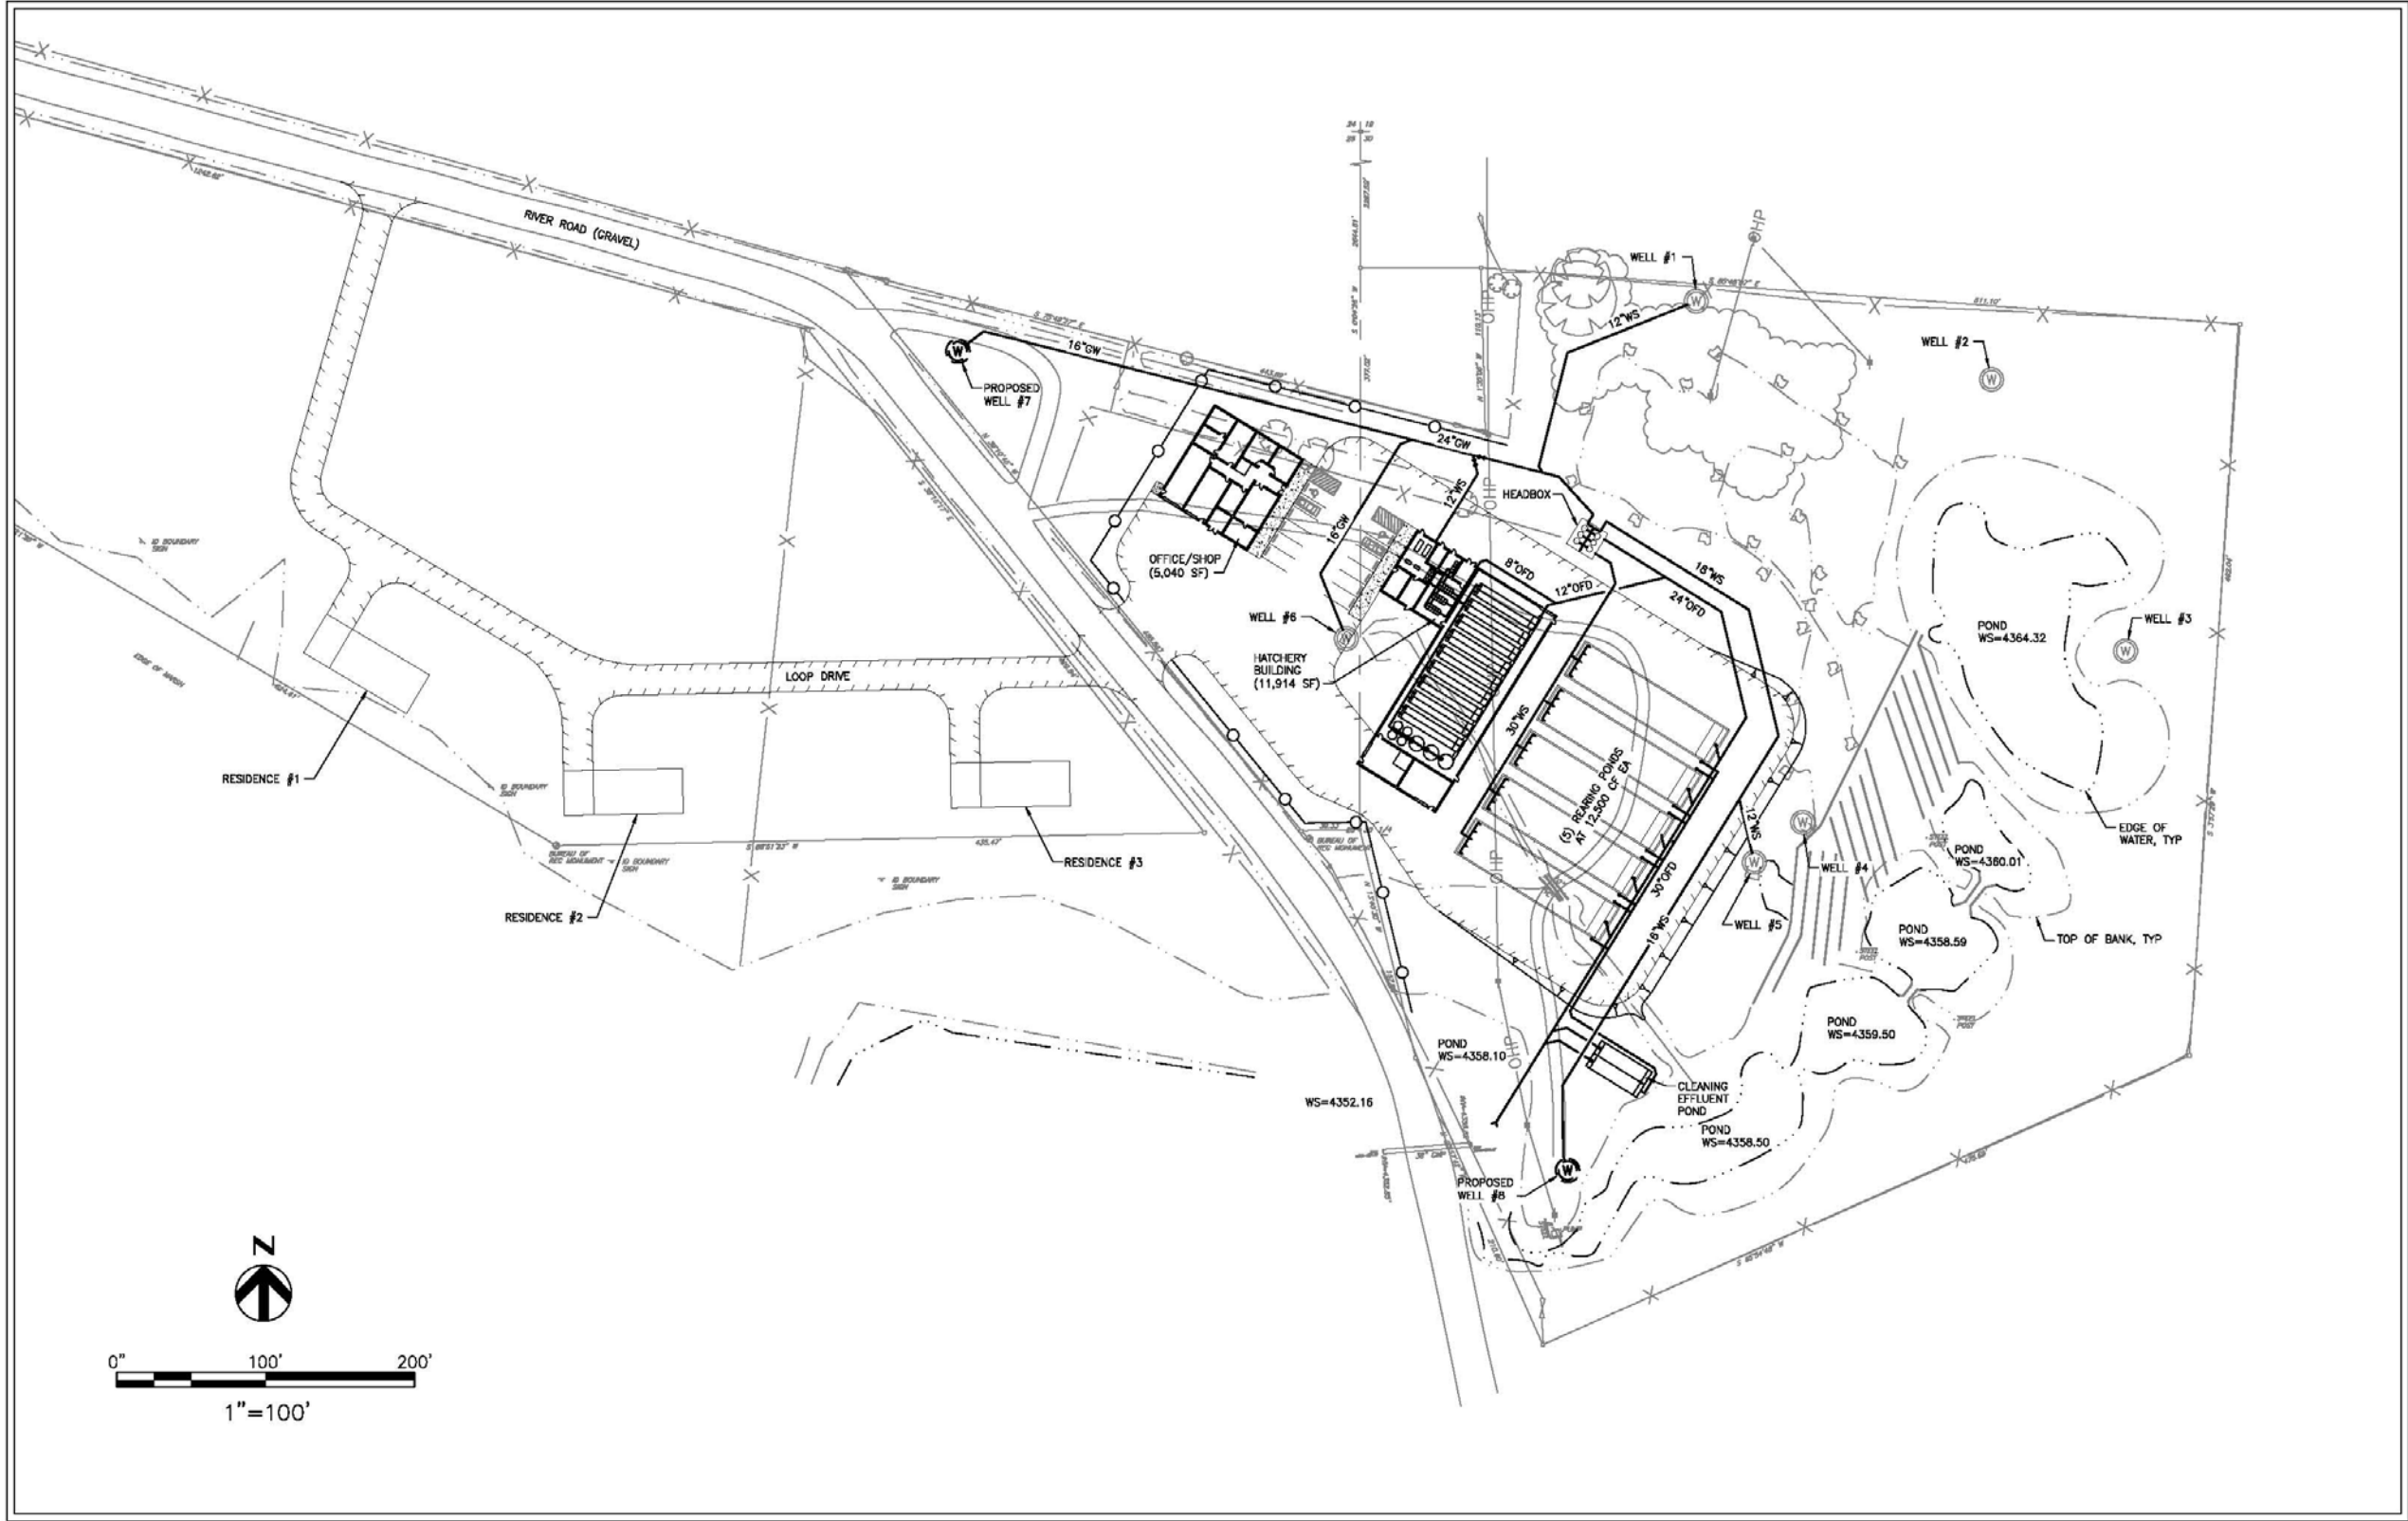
Conceptual site plan of Crystal Springs Hatchery improvements.
